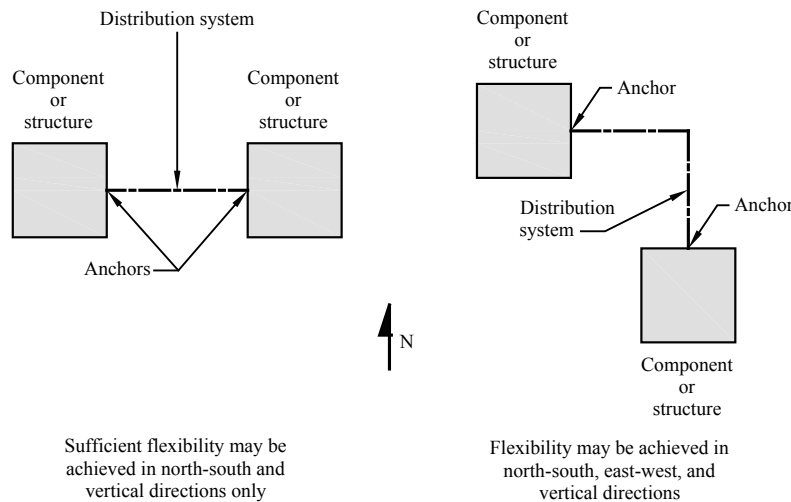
Schematic plans illustrating branch line flexibility.
